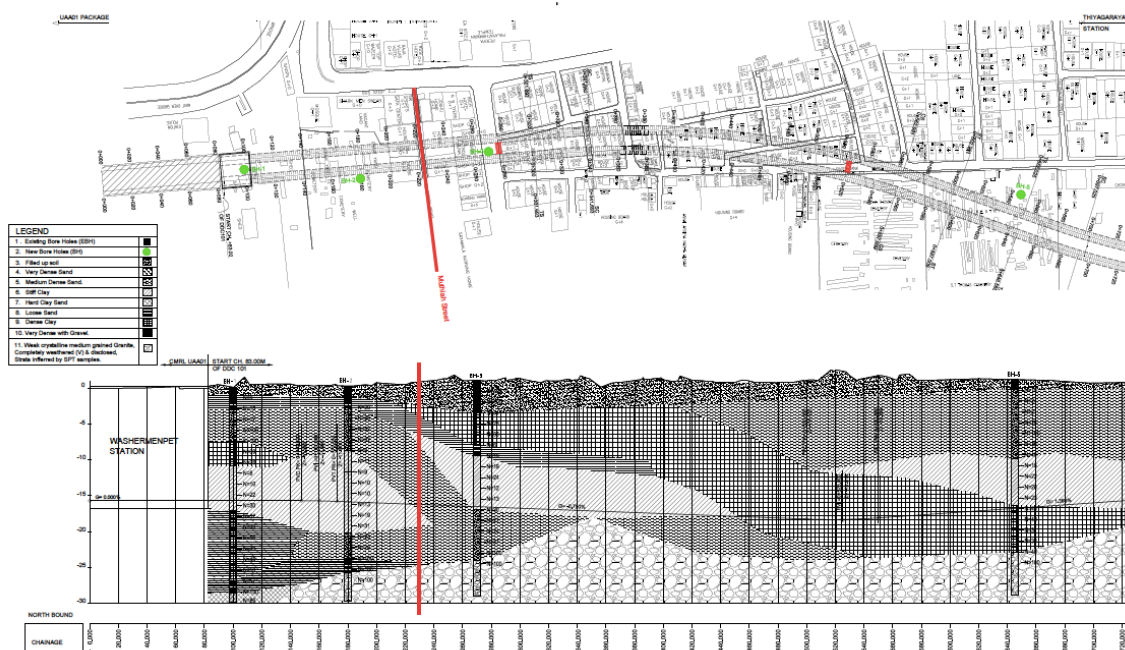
Detail of Washermanpet tunnel section from geotechnical surveys prior to construction, with location of the ‘sludge’ added (red line). CMRL/Systra, from UAA-08 tender pack, 2015.
